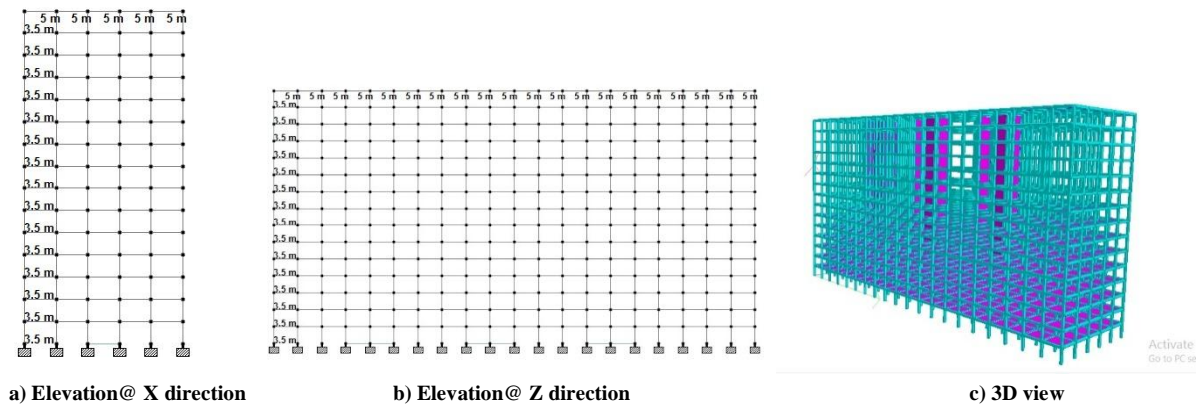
Model 2- G+14 Storey Building with rectangular geometrical plan.
